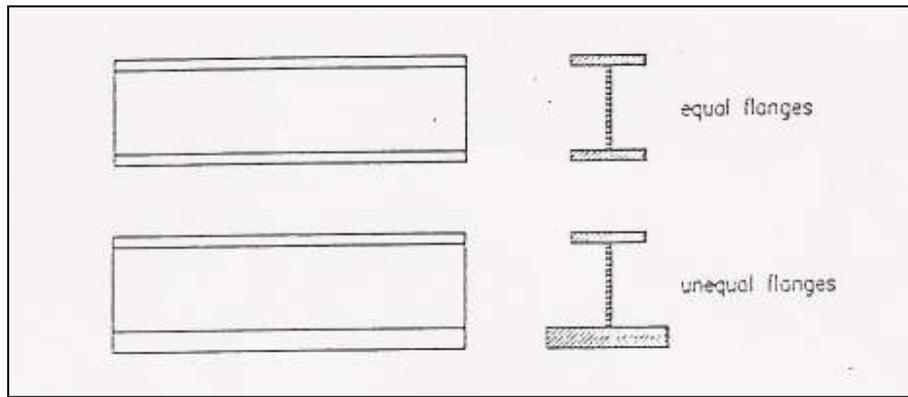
Fabricated plate girders (Source: Berklin, 1994)
